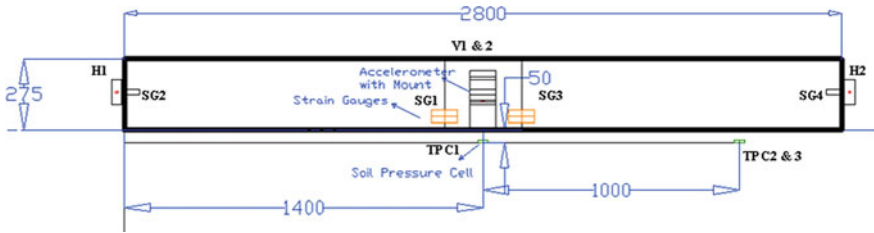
Instrumentation layout for Slab 1 (Front View)
